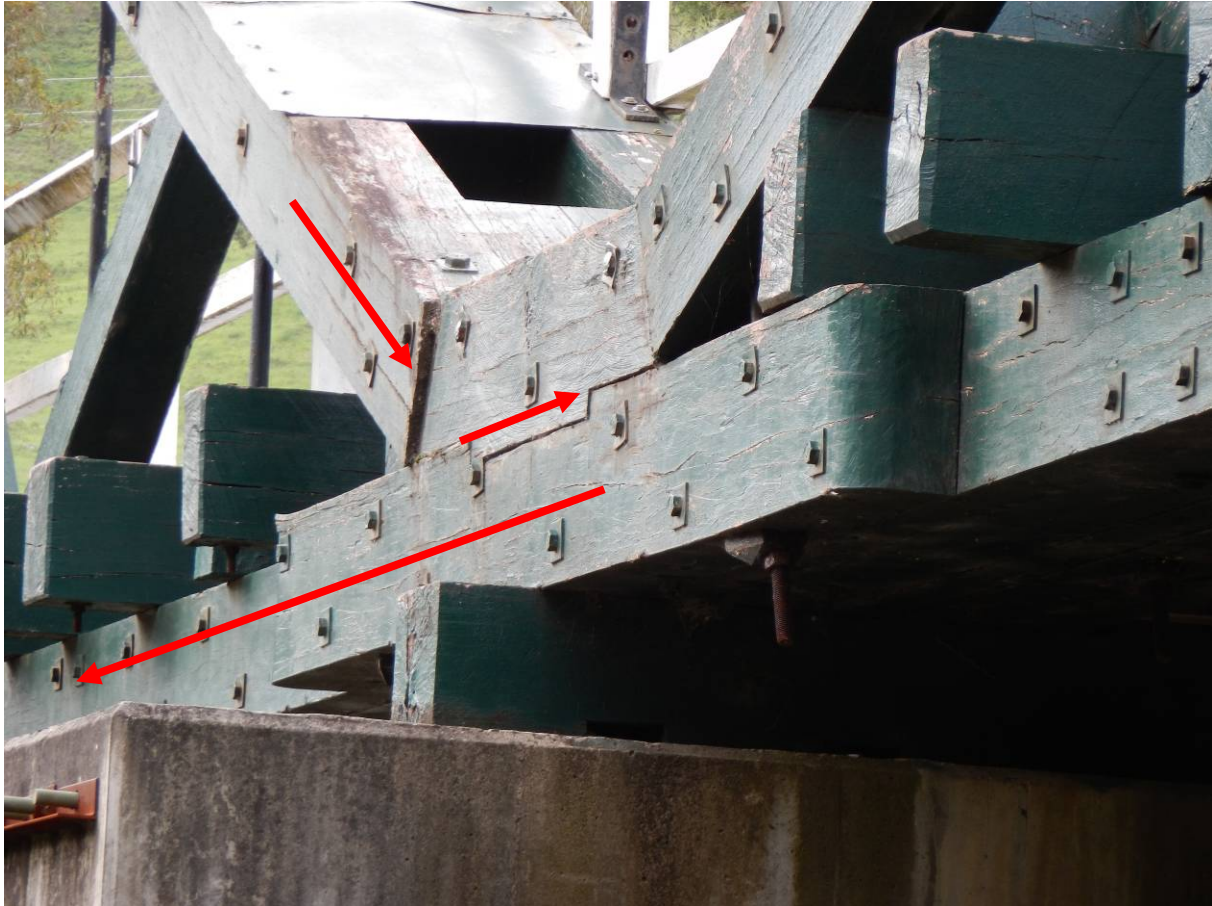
Load Path from Principals to Bottom Chord in Adjacent Span through Butting Block
